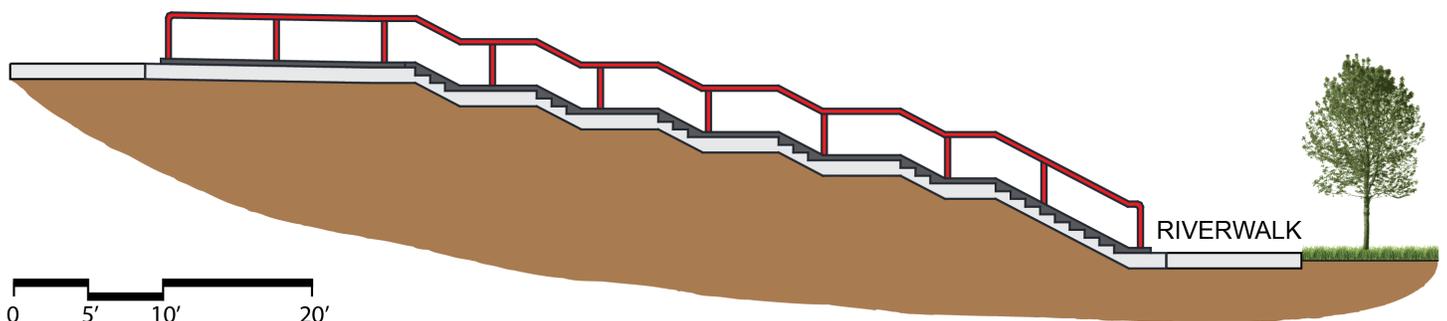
VIEW LOOKING AT THE SIDE OF THE PROPOSED STAIR THAT CONNECTS TO THE RIVERWALK
